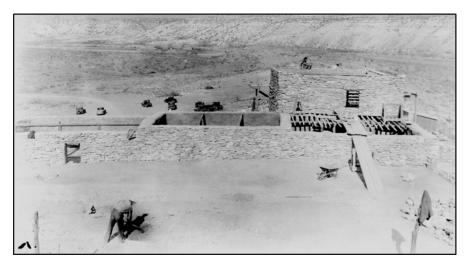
Reconstruction of Group IV at Tuzigoot Pueblo, 1934. Photo NPS
